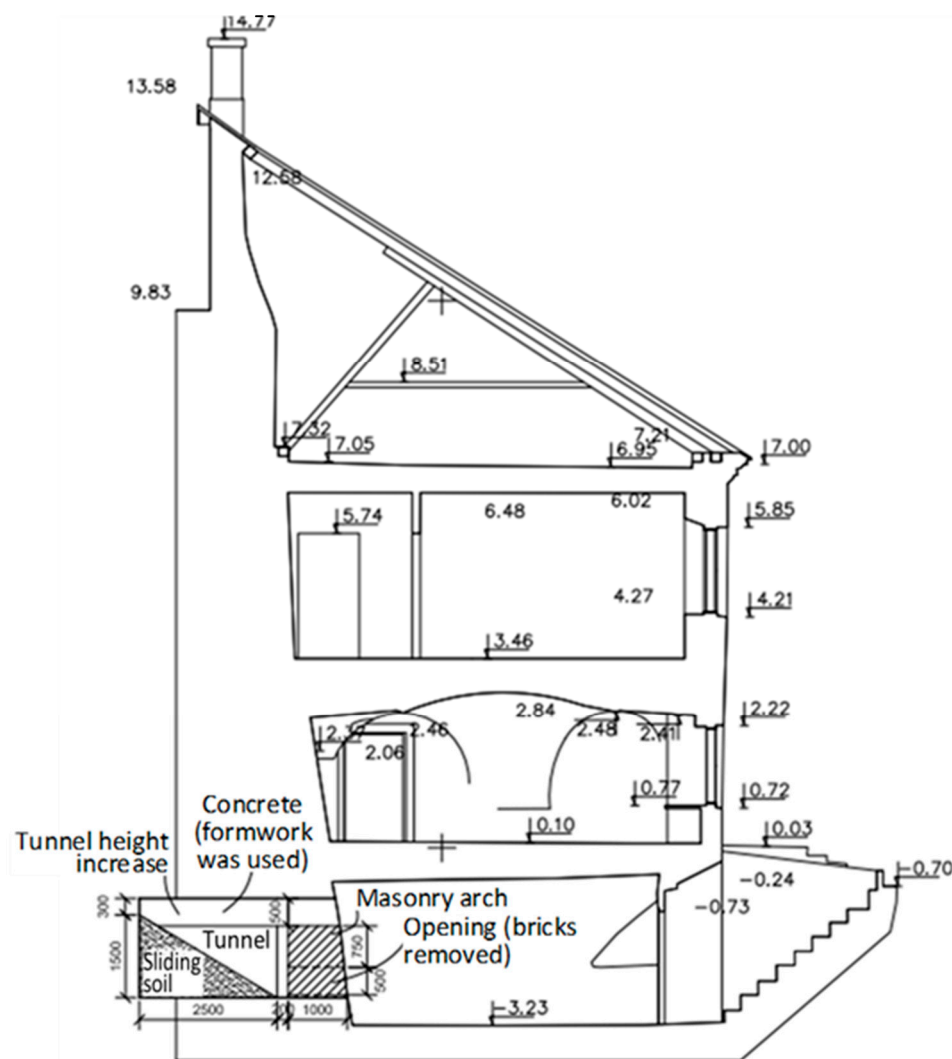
Cross-section of the Castle-Keeper's House, western retaining wall, and new tunnel.
